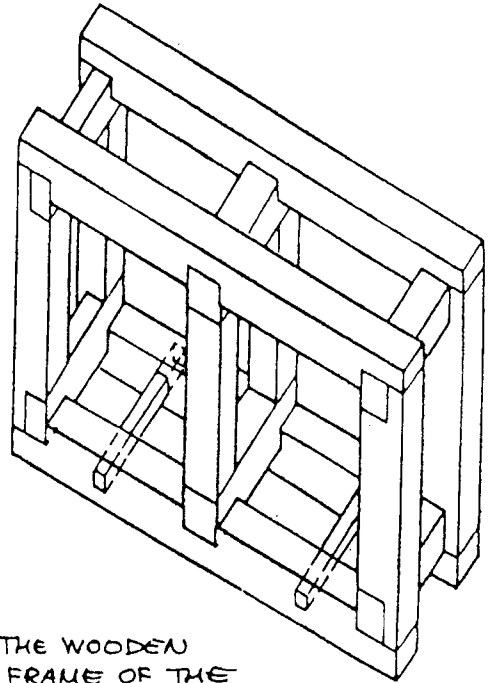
HEAVY WOODEN CONSTRUCTIONS OF THE EXCAVATED BUILDINGS IN AKROTIRI OF SANTORINI (THIRA) 1500 B.C.
